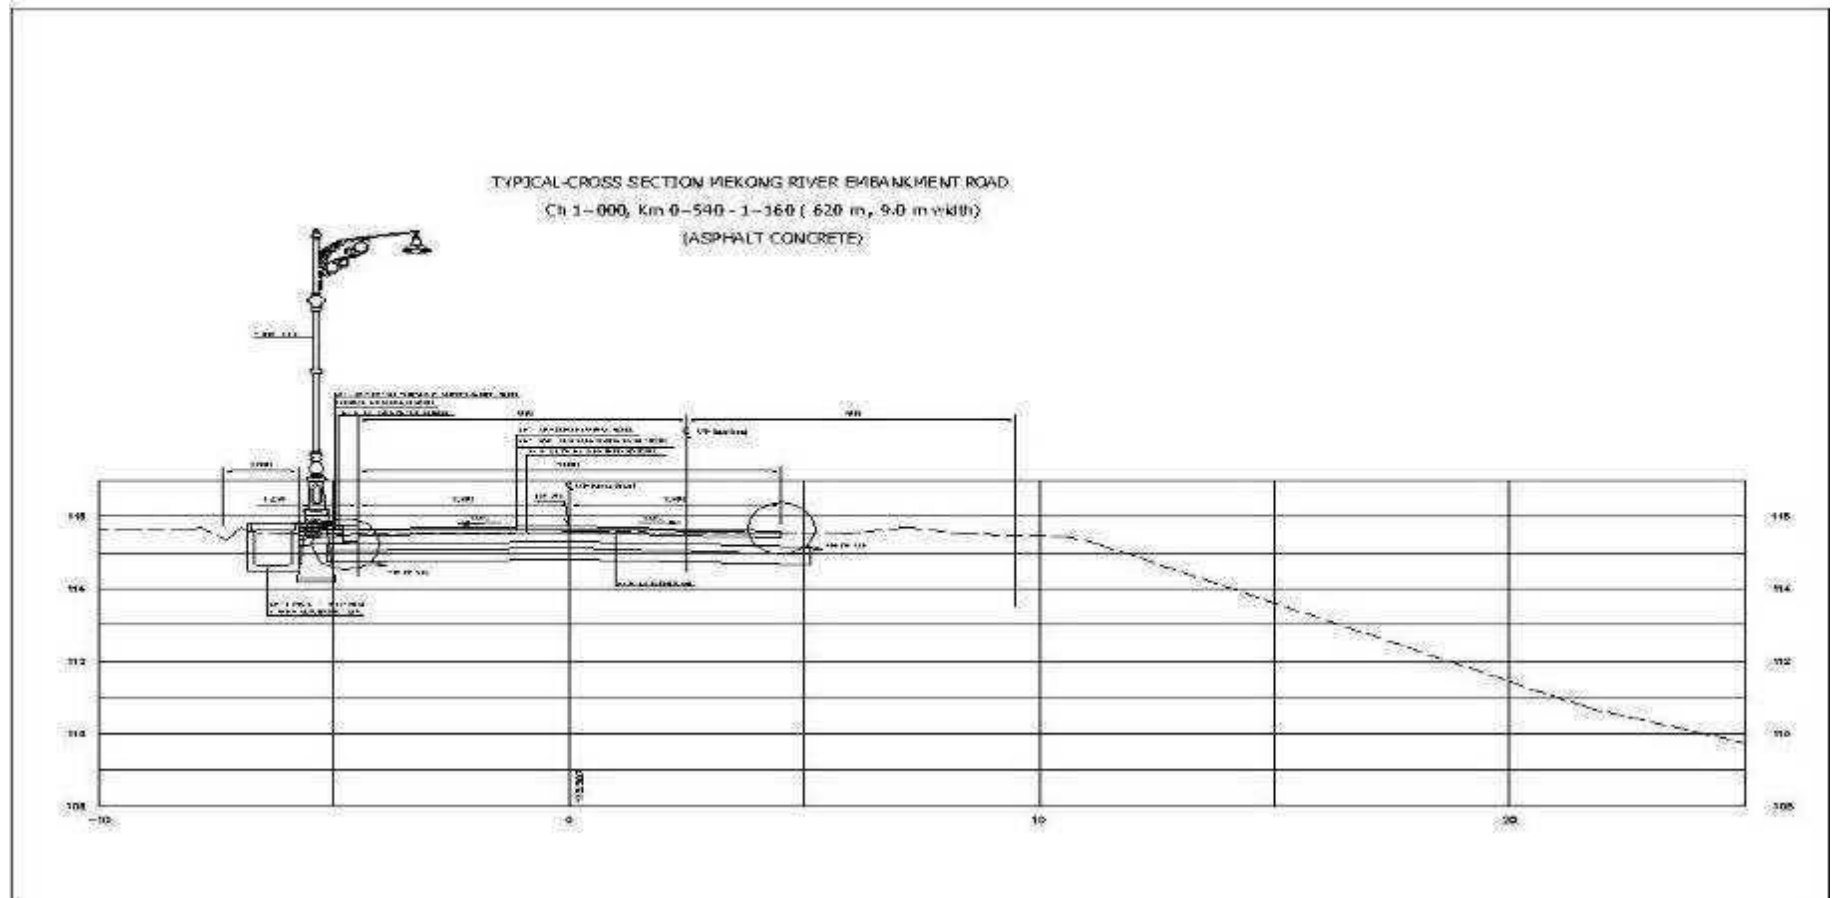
Cross section for Tha Hae Road X-Sec 1 - Ch. 1+000
